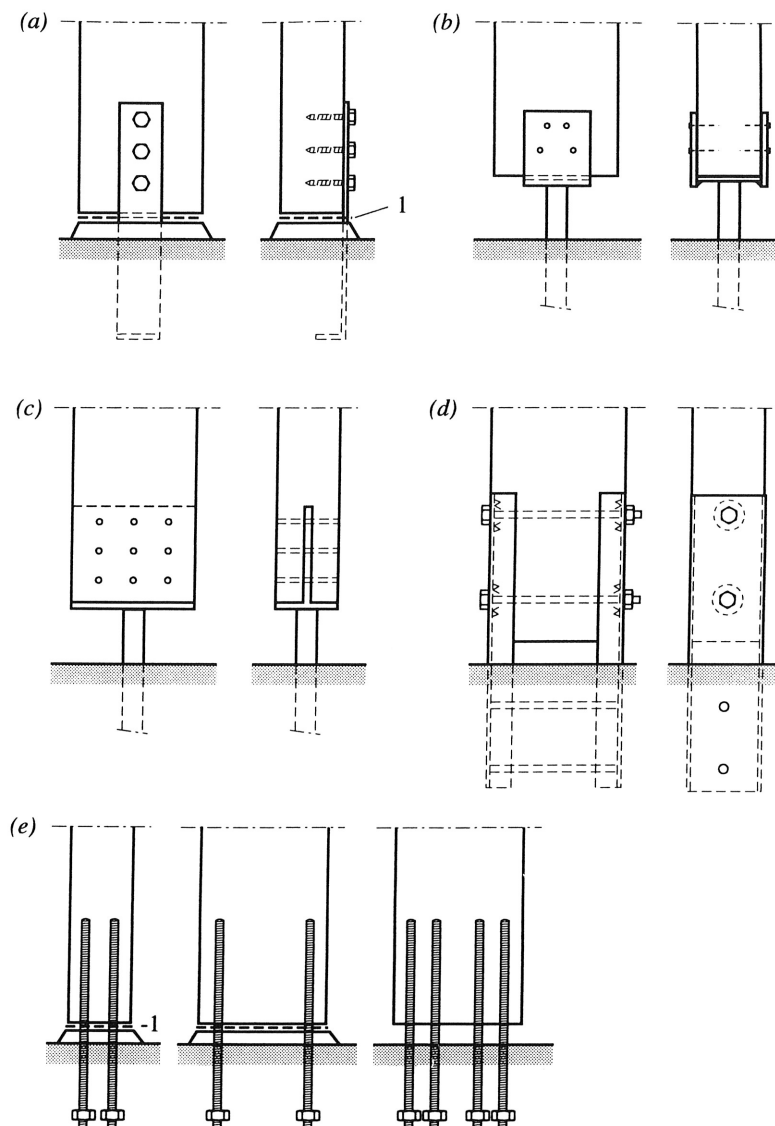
Joint type 2, column to foundation. (a) (b) Simply supported columns with nailed, bolted or screwed steel bar or column shoe. (c) Simply supported column with steel plates in a slot. It is important to place an effective vapour barrier between wood and concrete. (d) (e) Built-in columns with channels or glued in bolts cast into recesses in the foundation. The column end can be free or packed up to increase the load-carrying capacity in compression as well as bending. 1 = asphalt felt.
